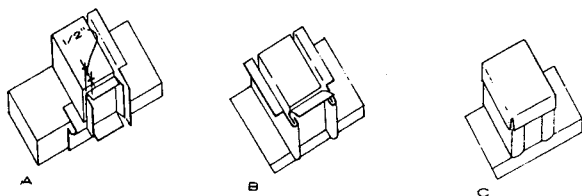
BATTEN ALTERNATES FOR METAL ROOFING
